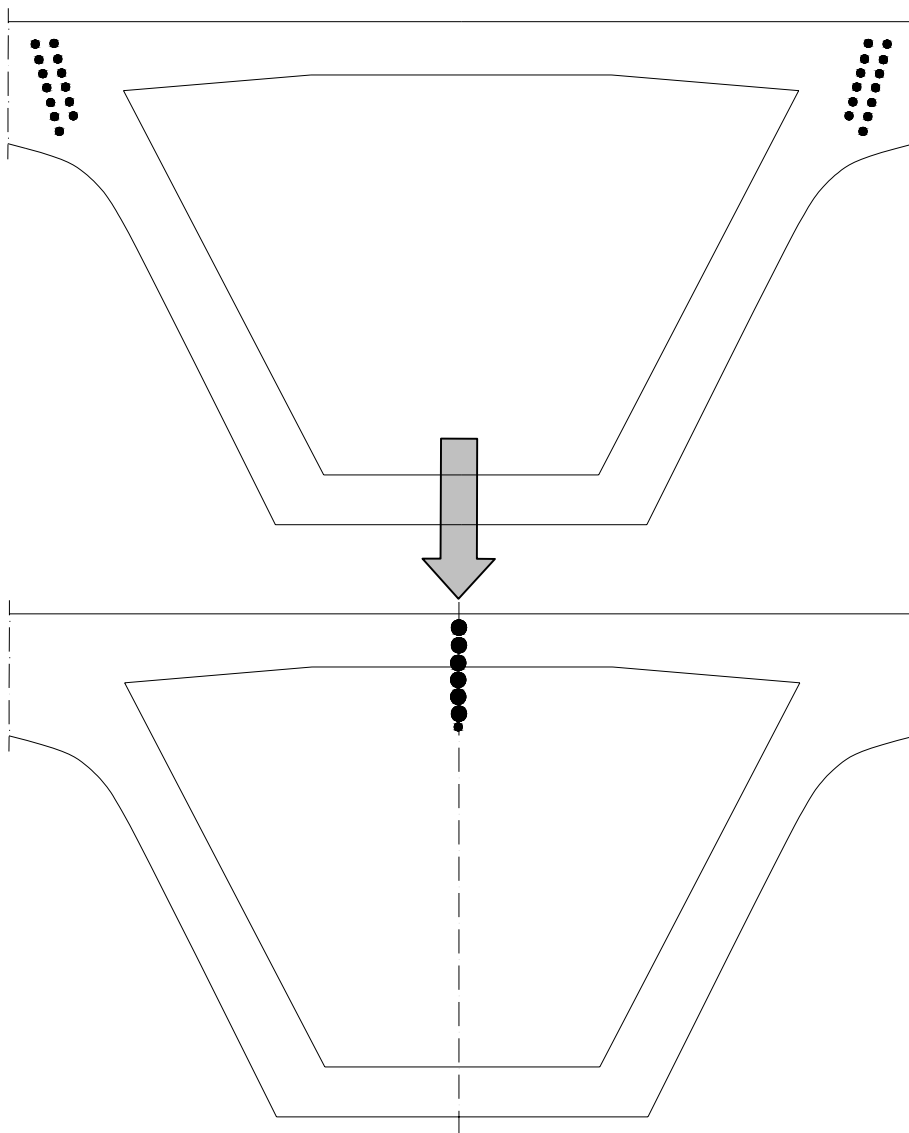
Top: The cross-section of the box girder. Bottom: Simplified cable layout used in model.
